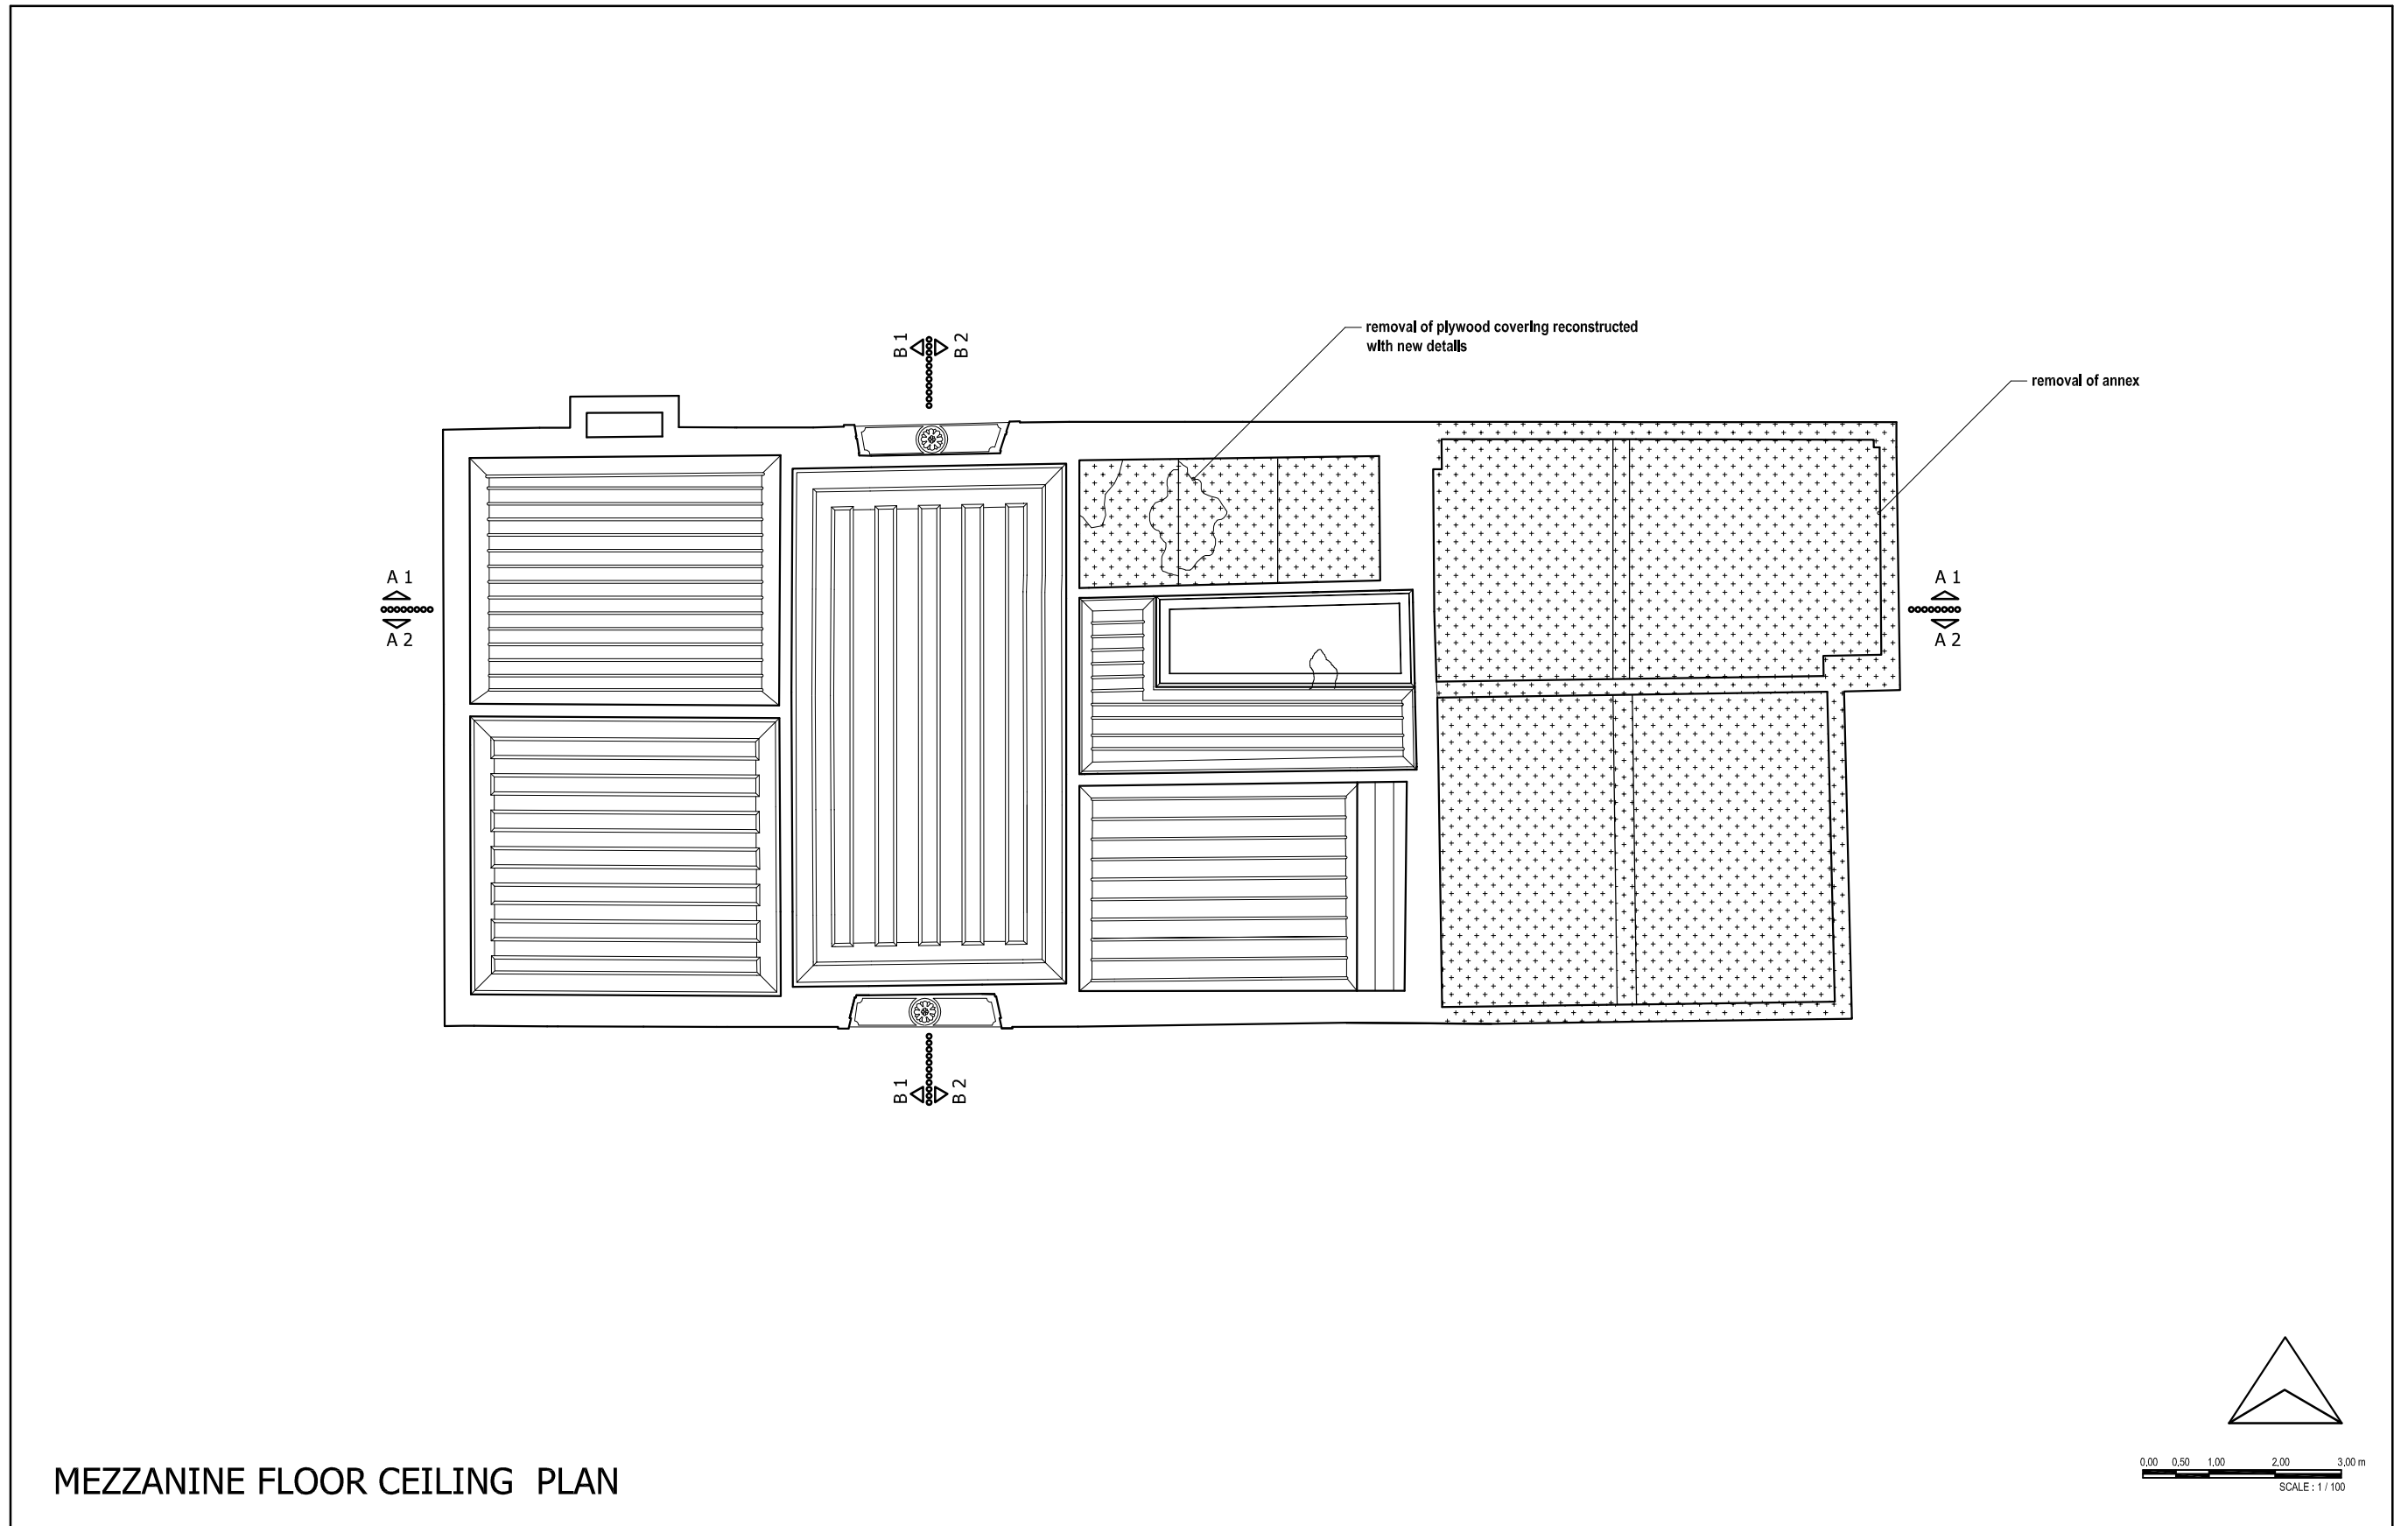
Measures for Ethics of Conservation- Mezzanine Floor Ceiling Plan
